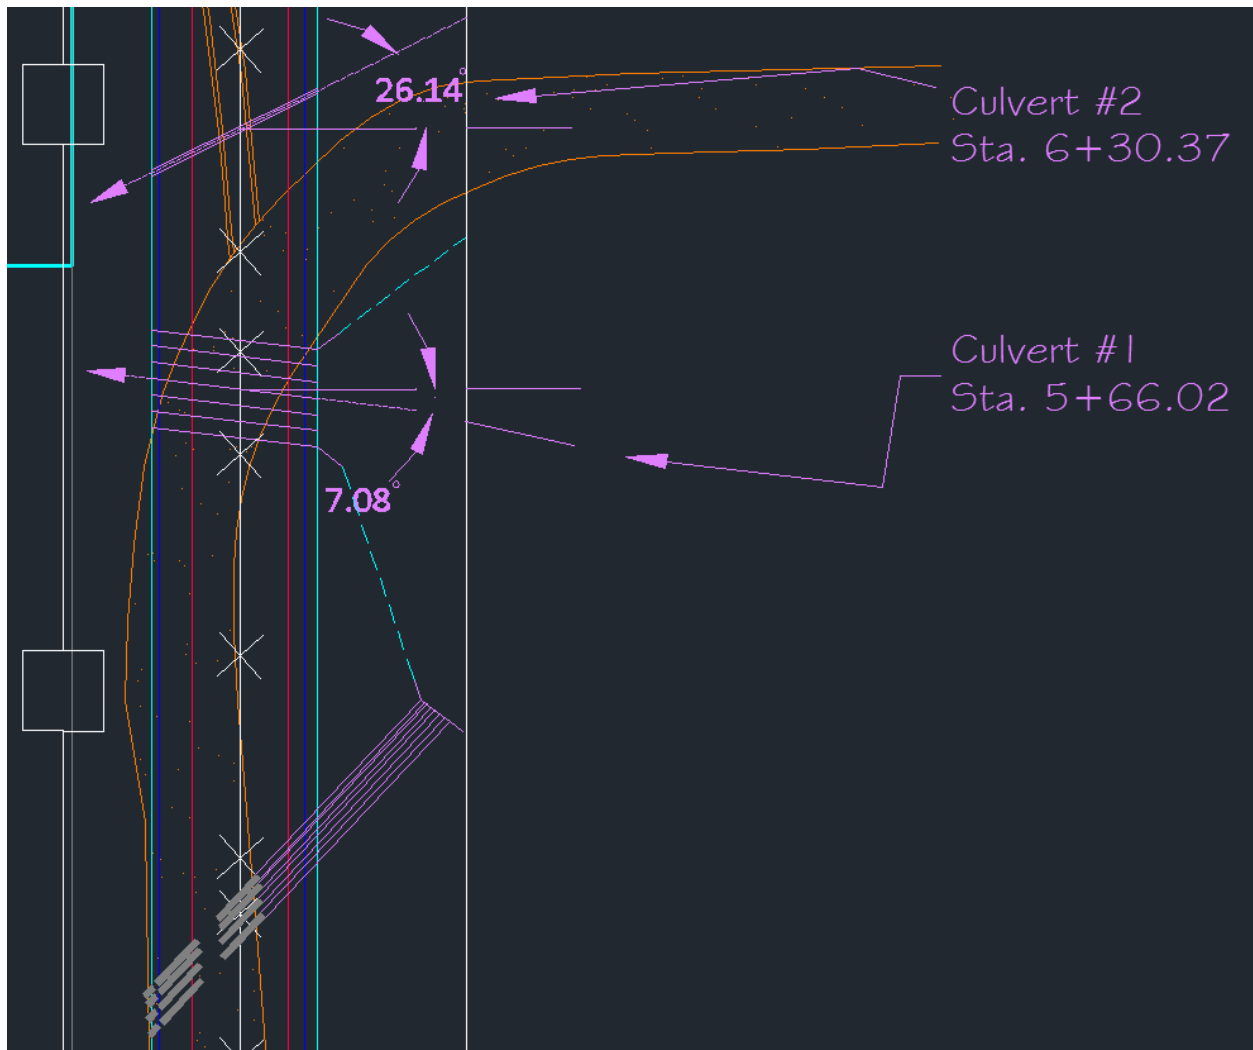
Plan View of Culverts, Wingwalls, Headwalls, & Fill lines (dotted light blue)
